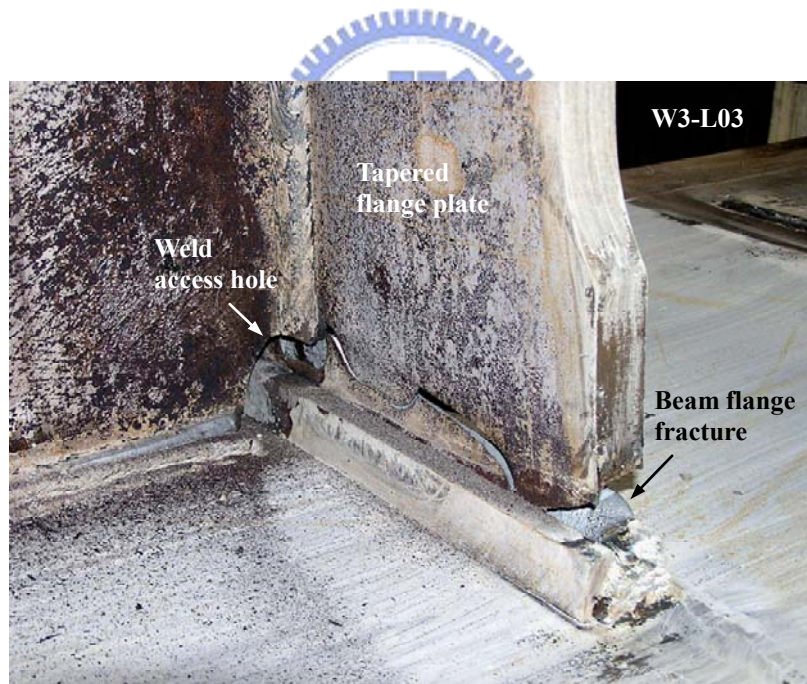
Fracture of beam flange groove weld of specimen W3-L03 at 4% rad story drift angle.
